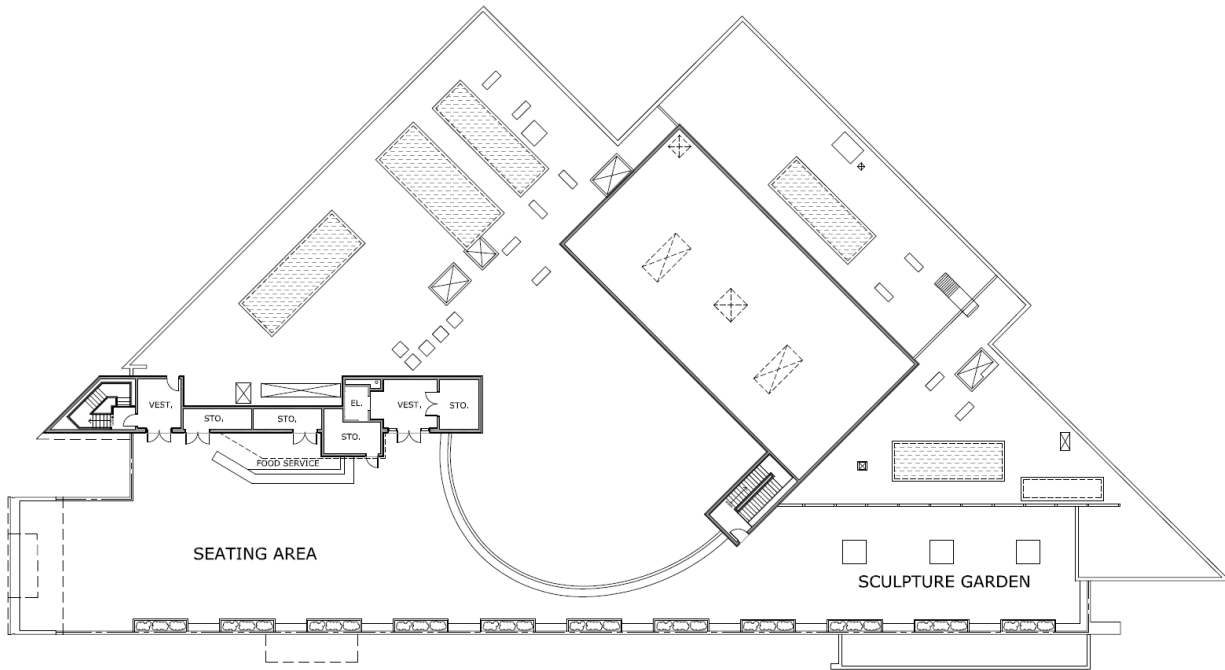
| Schematic plan of the Roof Terrace. Please see Appendix L for more detailed drawings.
